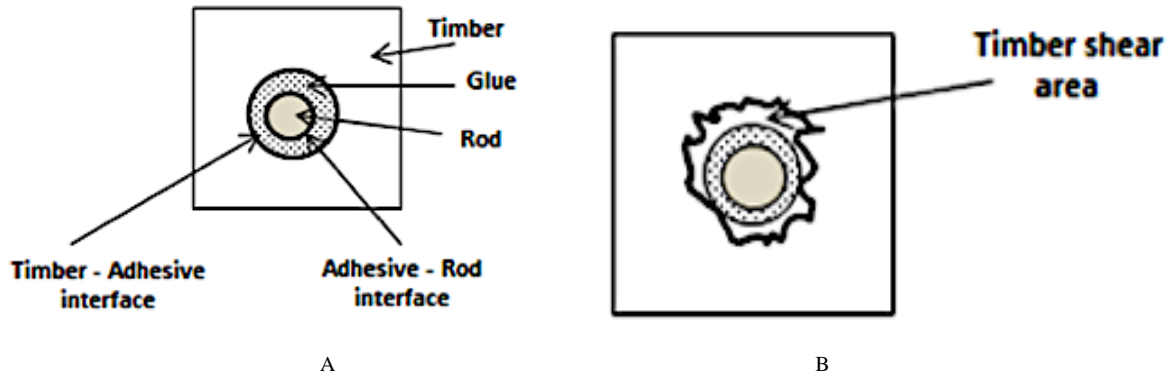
Cross-Section Specimen Sketches; (A) Before Test (B) Timber Shear Failure after Test
